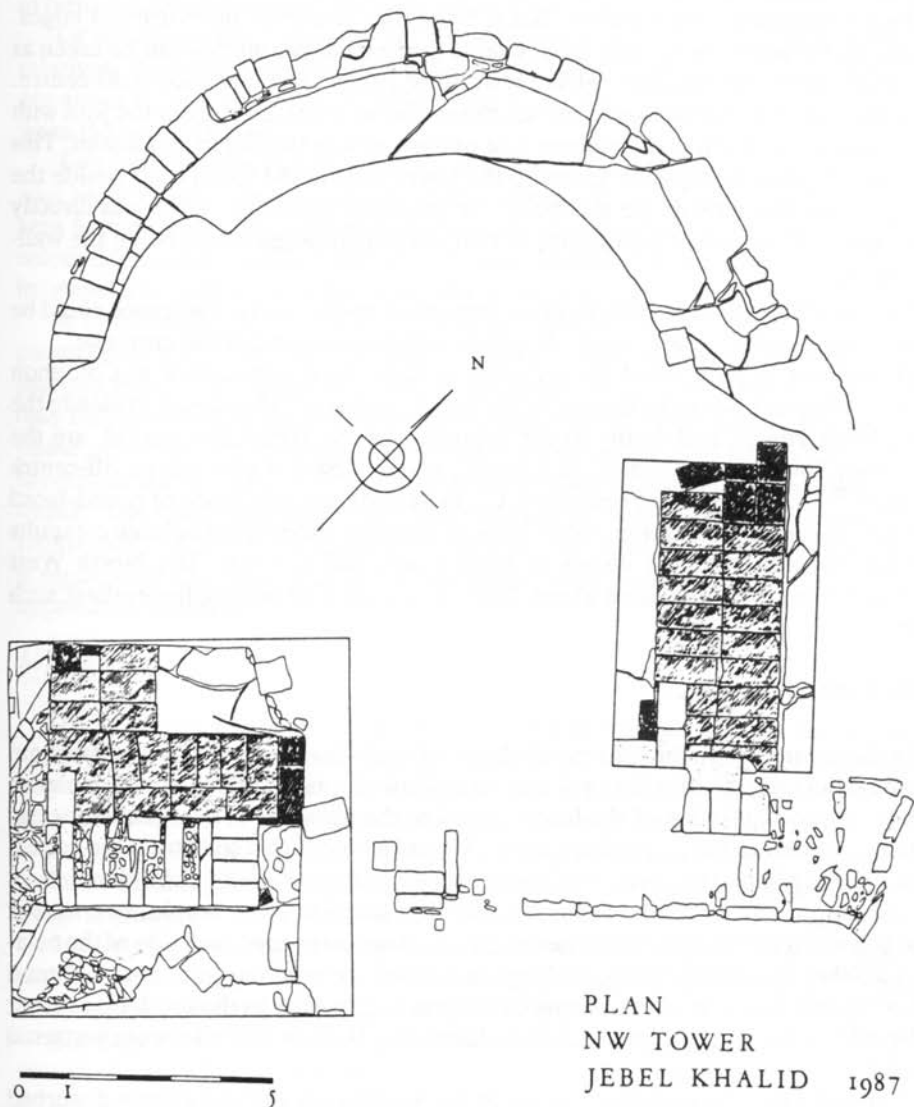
Plan of North West tower, showing the two trenches, and the traces of wall blocks at the outer perimeter.
